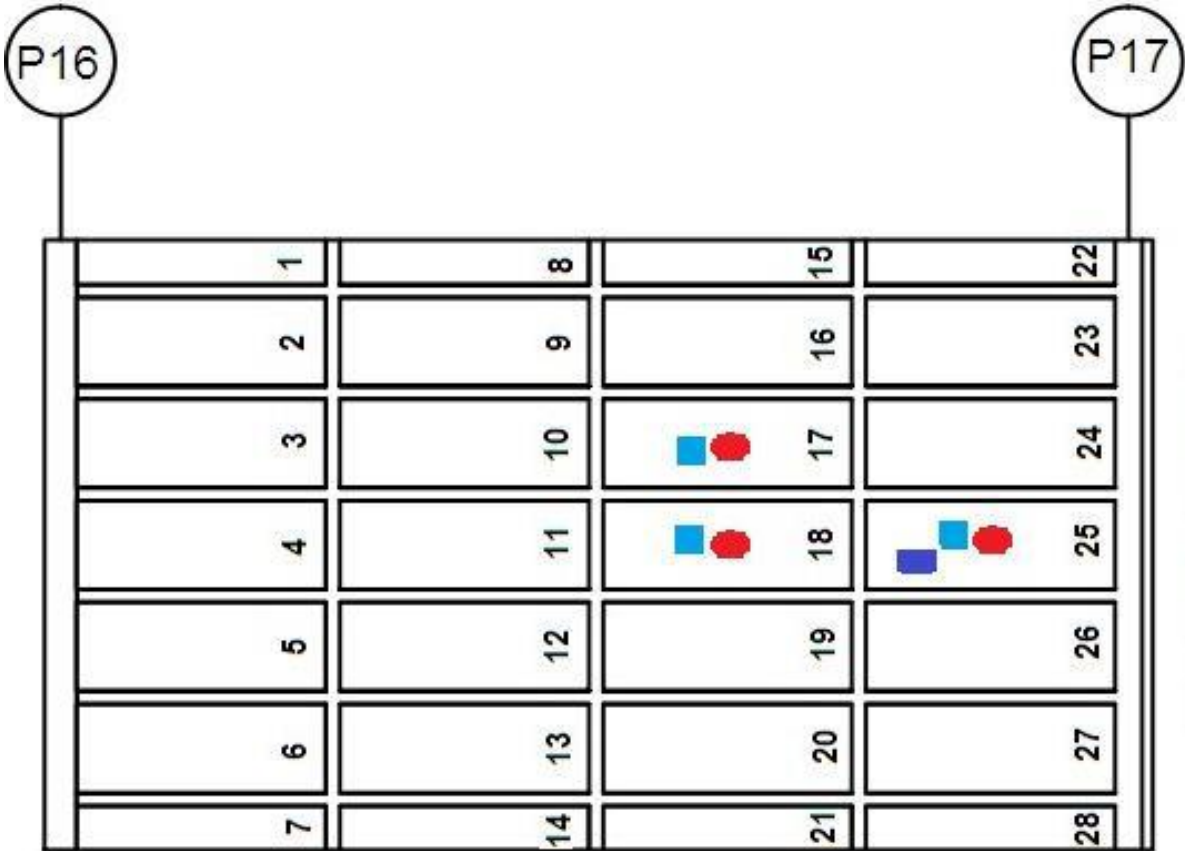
Test conducted at various locations between Pier P16 and Pier P17
